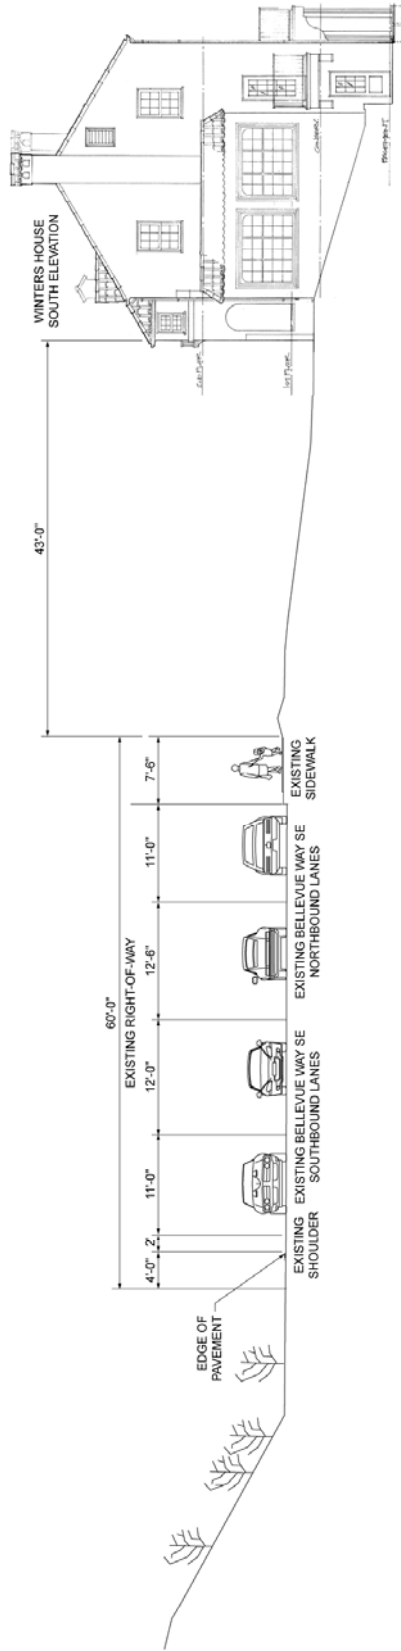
depicts the Winters House with the proposed project, and Exhibit 3-9 shows the cross-section for *Preferred Alternative B2M* with the existing cross-section. The perspective and cross-section views illustrate minimization approaches incorporated into the project design to maintain historic integrity during light rail operation.
